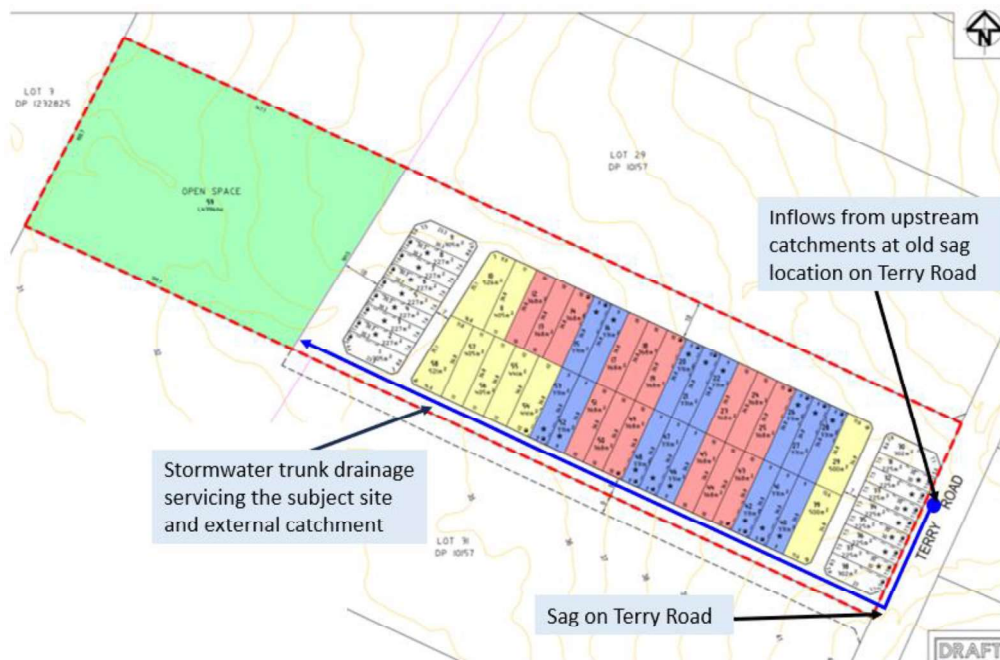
Stormwater trunk drainage system servicing the subject site and external catchments
